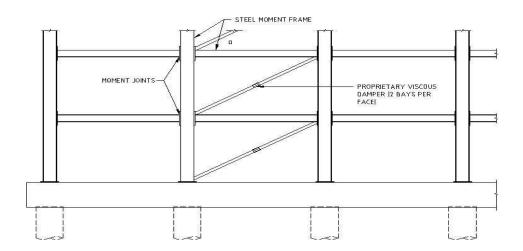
Viscous Damped Steel Frames (long Direction only).
